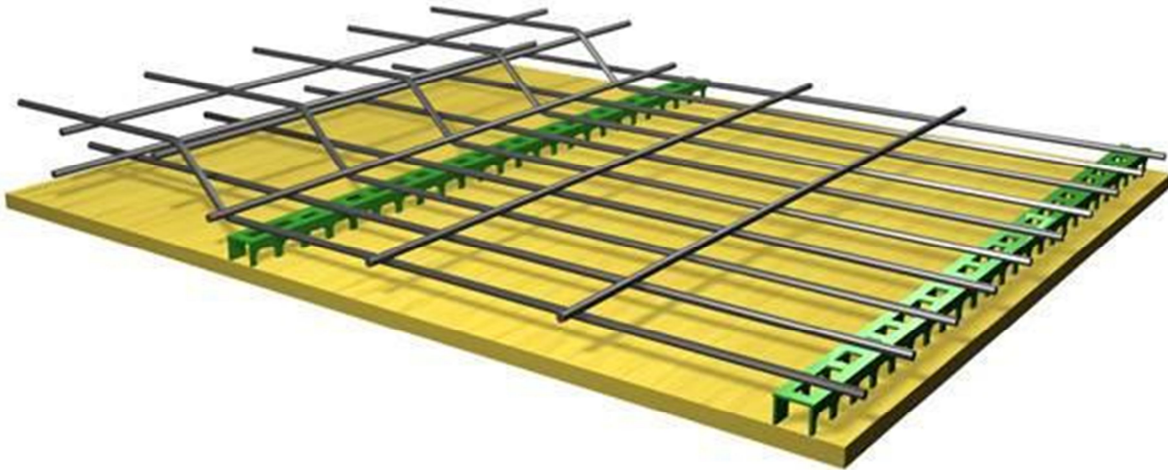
Typical Slab Reinforcement Pattern (straight & cranked bar). Rules for slab reinforcement distribution.
